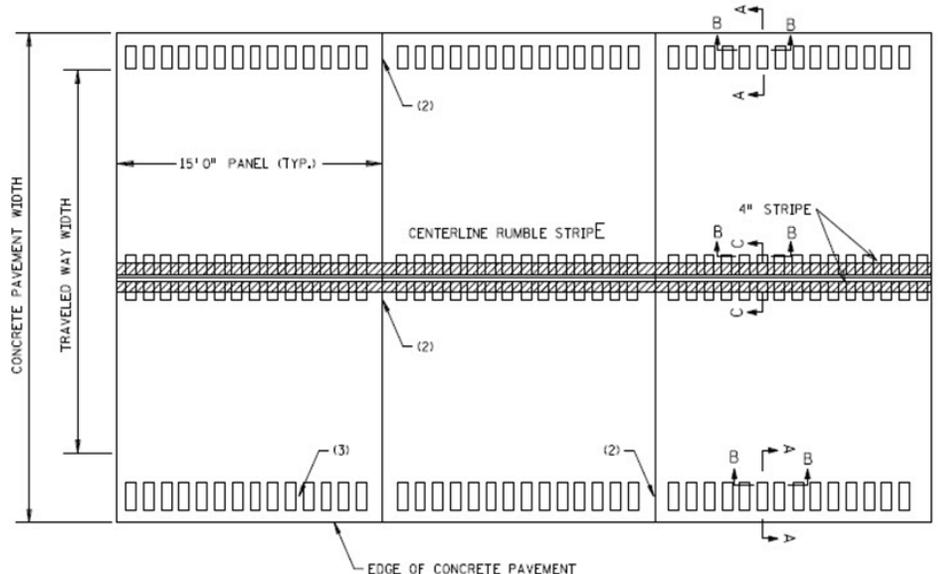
CONCRETE PAVEMENT OPTION B - CONCRETE RUMBLE STRIP
